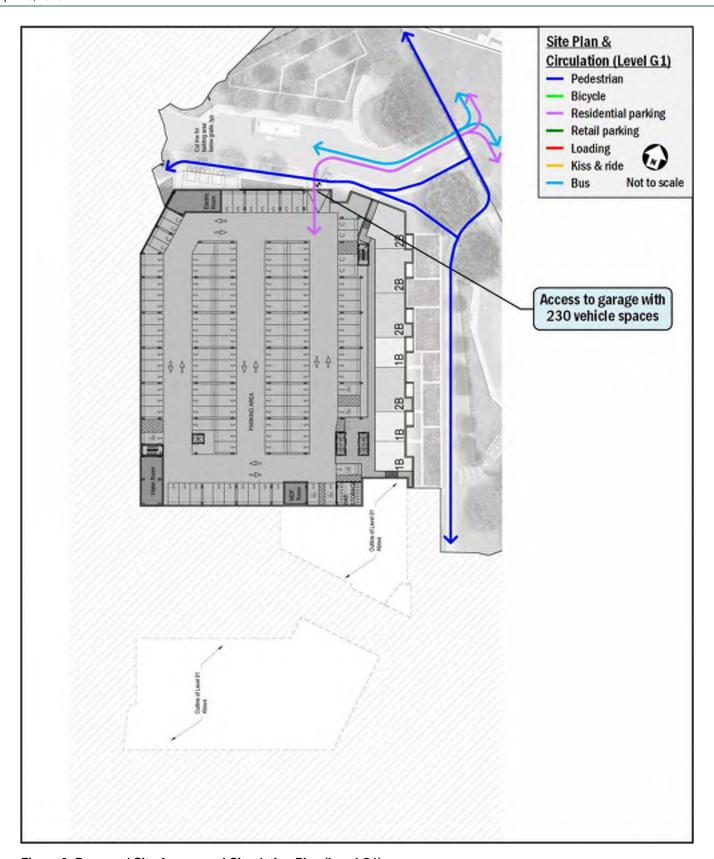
Proposed Site Access and Circulation Plan (Level G1)
